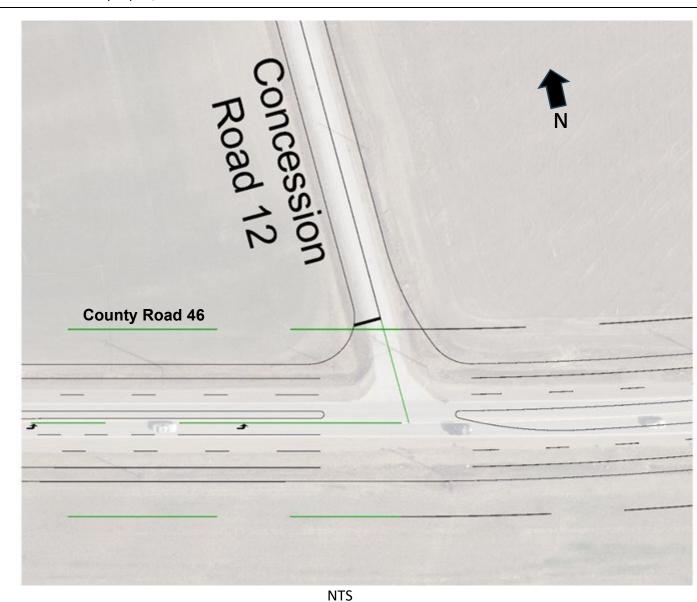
County Road 46 and Concession Road 12 Intersection Alternative A
